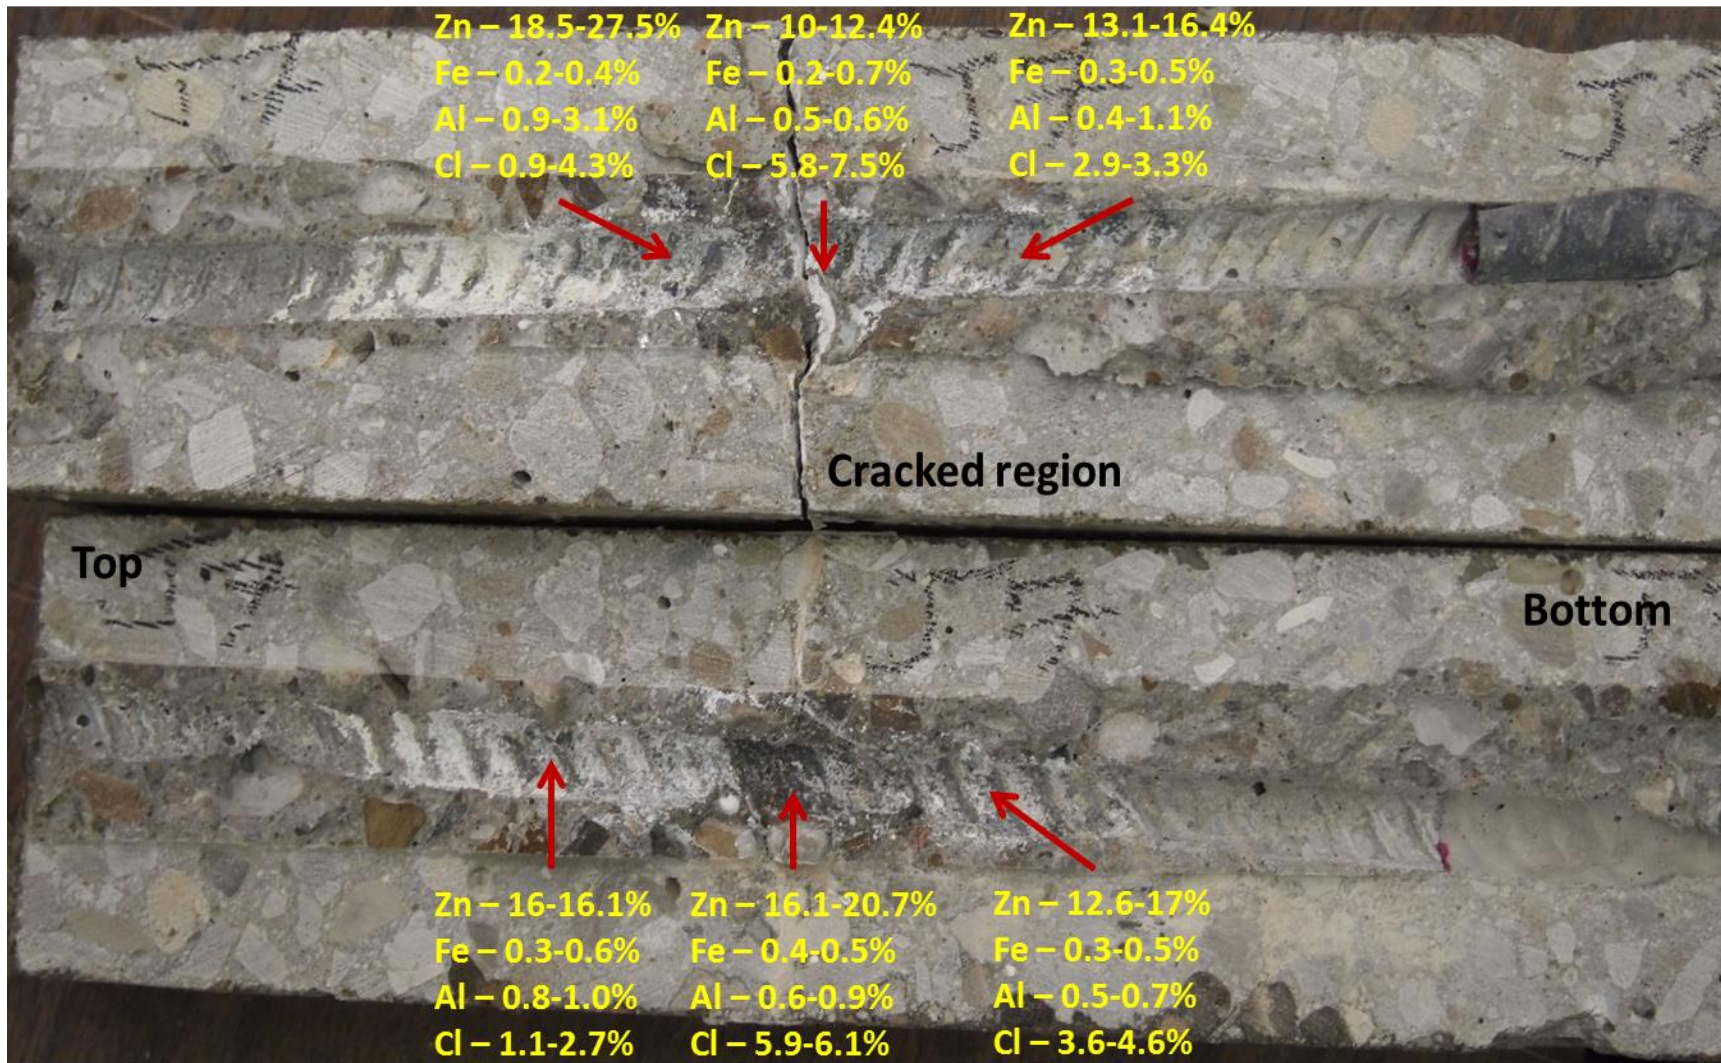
XRF analysis of autopsied transversely cracked C3 concrete specimen
